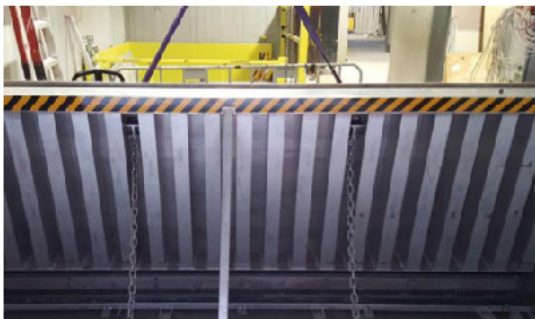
Other entrances to the building are protected with self-actuating tilting flood barriers. The flood barriers required custom design and manufacture to address all relevant safety factors raised by Melbourne Water, including flood type, possible debris, maintenance and operation.
